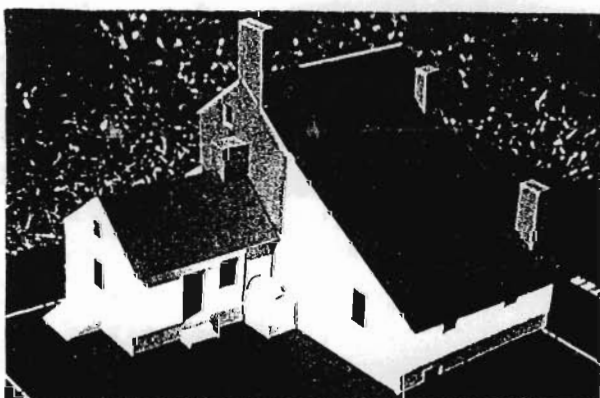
Period C, c. 1740 showing the east facade with frame shed roof addition to Period B.
